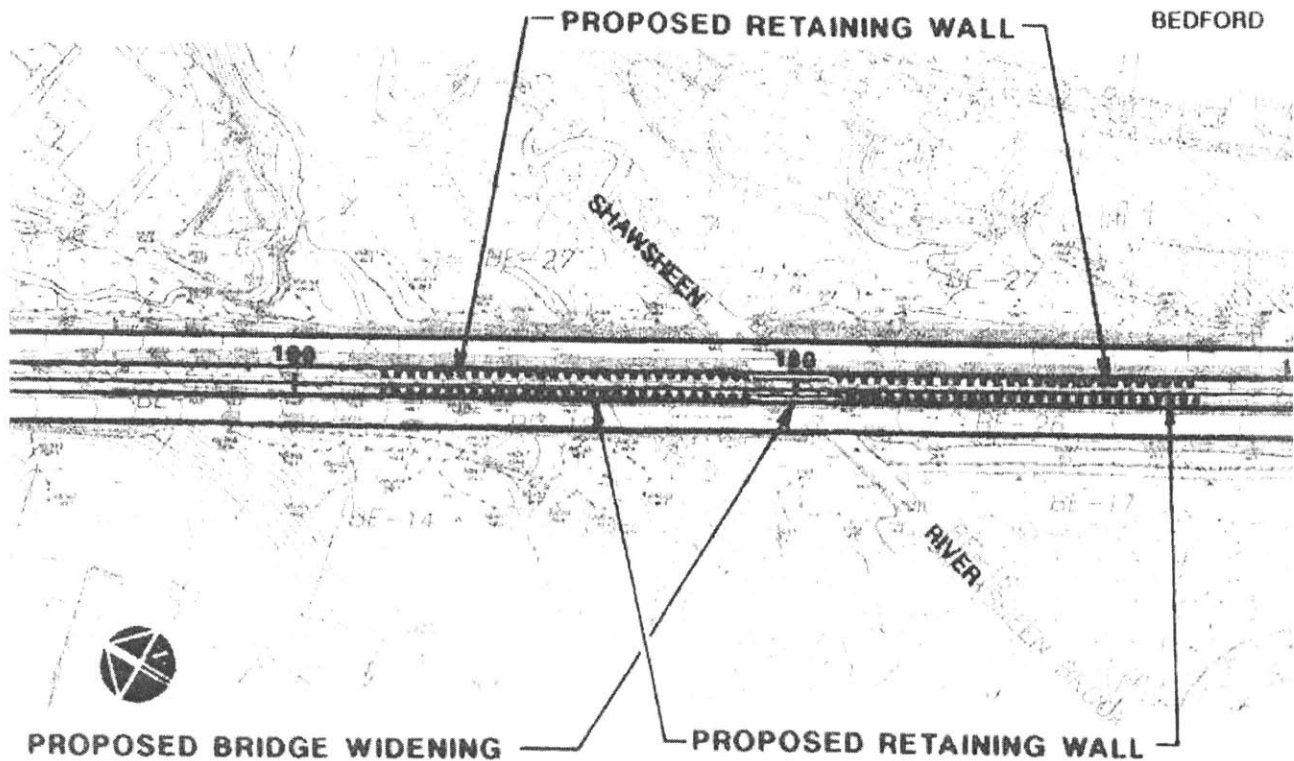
Plan View of Shawsheen River Bridge Modification (NTS)
